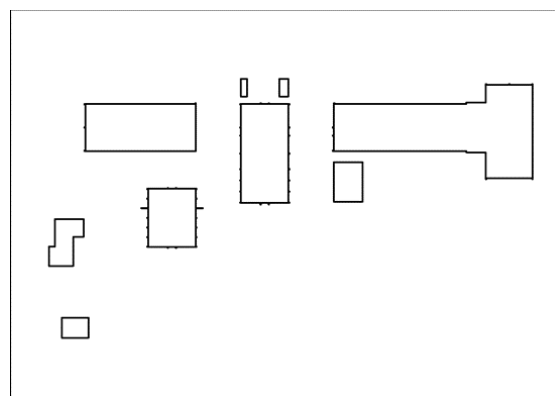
Example of a floor plan of a Brazilian Youth Prison - Form D
